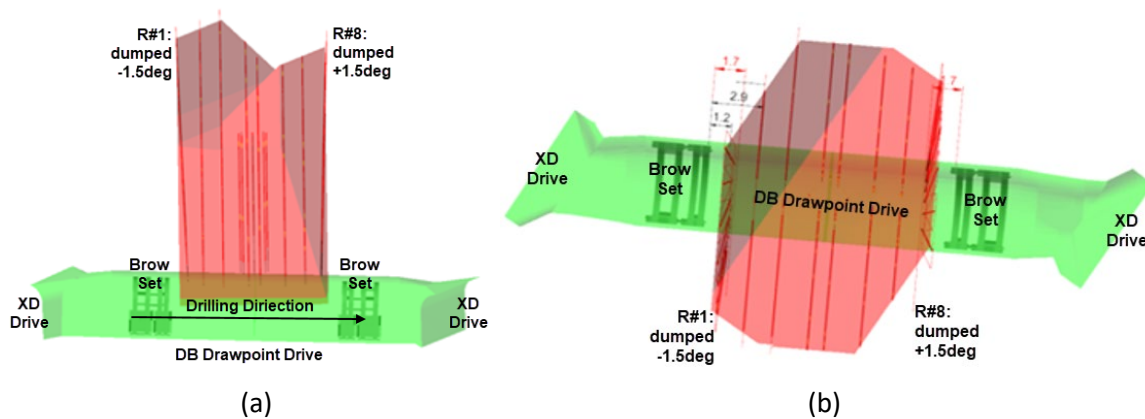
(a) The long section view of ring dump adjustment at P0 drawbell; (b) The plan view of ring dump adjustment at P0 drawbell
